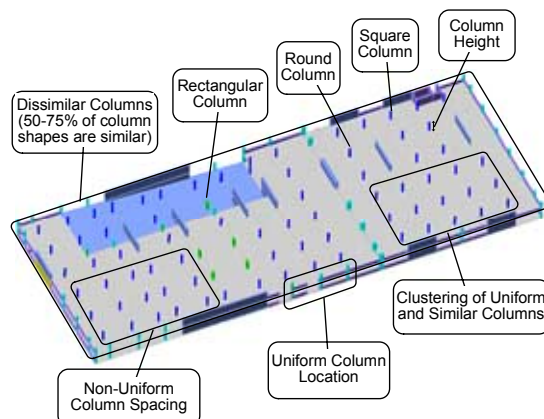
Concrete column scope for a 2-story parking structure project highlighting some of the design conditions that affect concrete construction.
